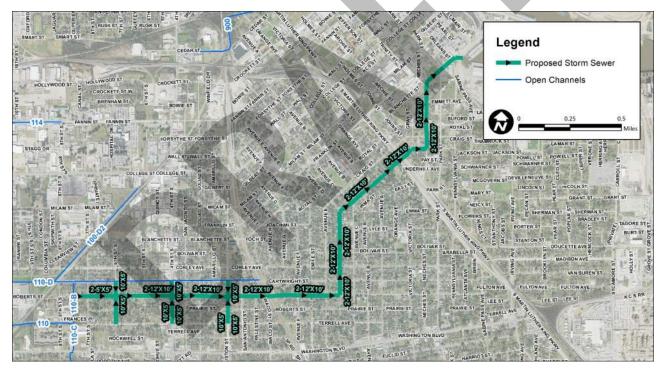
Proposed Blanchette Diversion – Storm Sewer Alignment
